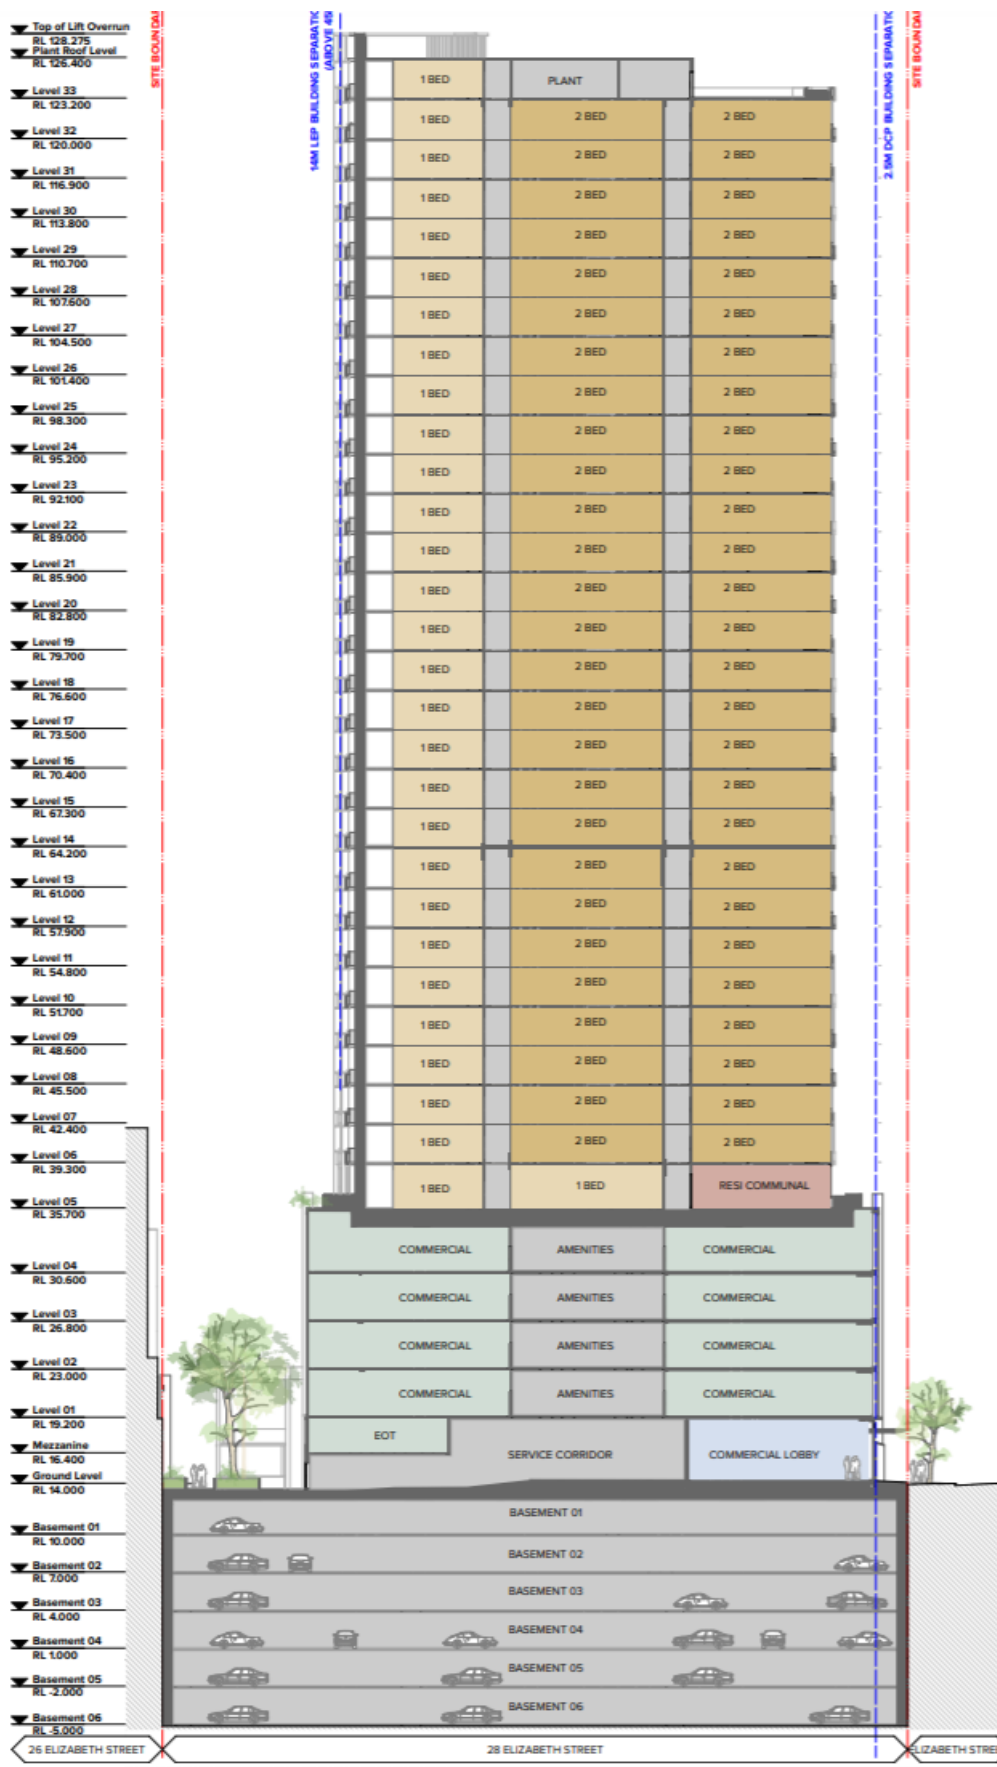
Typical Section, Section AA, including 6 levels of basement to RL -5.000
